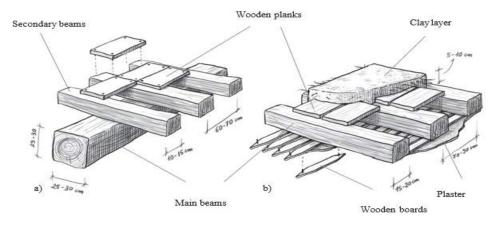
Typical floor cross sections: a) wooden floor; b) compressed earth floor.
